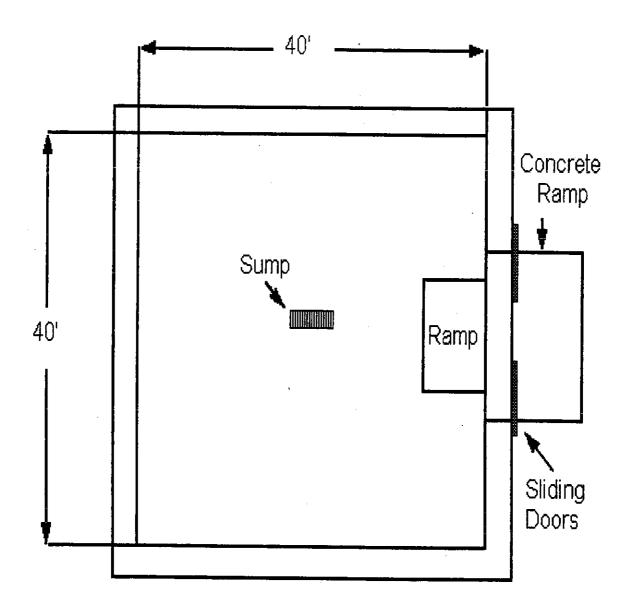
Mixed Waste Drum Storage Facility, Building 7507W.
